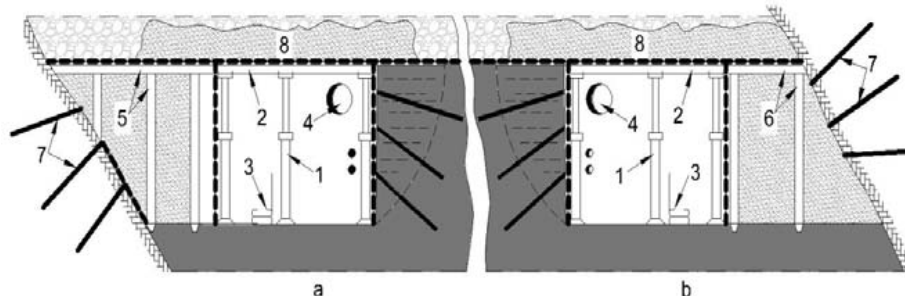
Support of the angular short-wall zones: a) at the coal floor; b) at the coal roof [3], [8]
